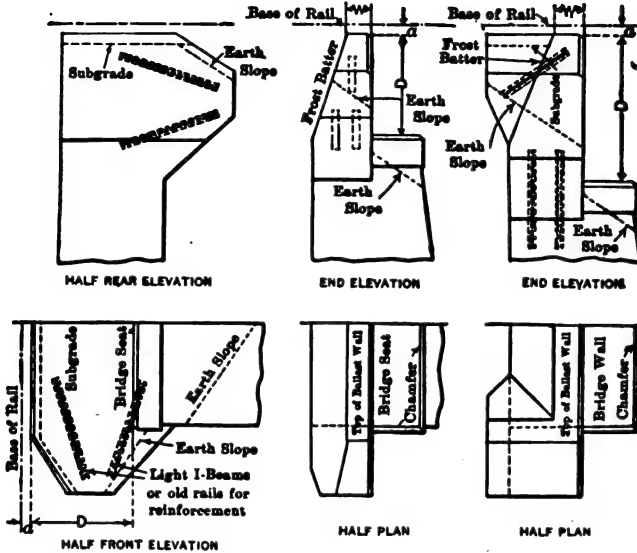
CONCRETE ABUTMENTS. LUTHER.
